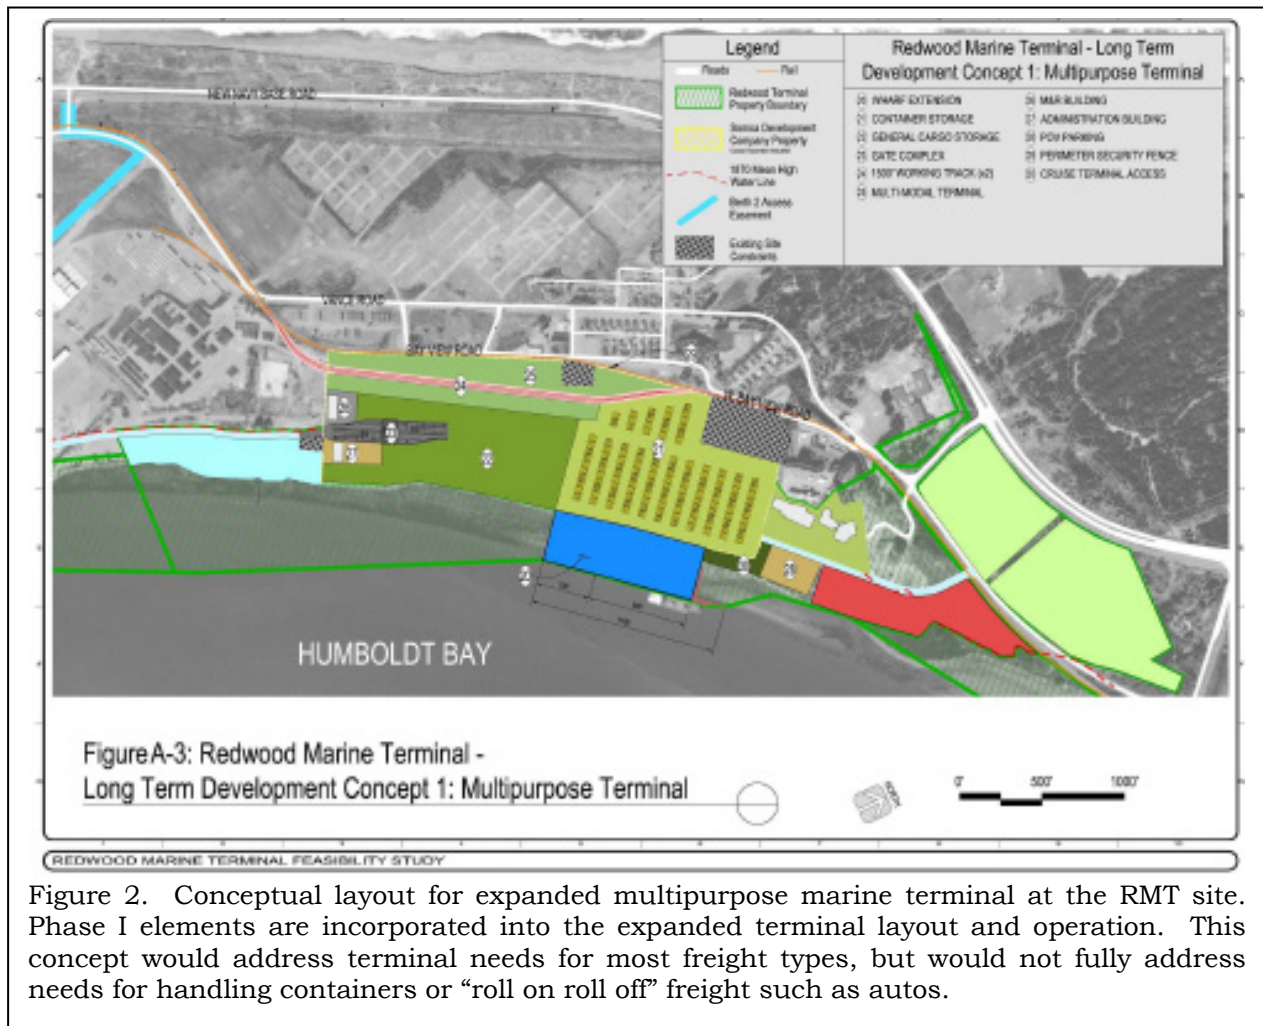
Conceptual layout for expanded multipurpose marine terminal at the RMT site. Phase I elements are incorporated into the expanded terminal layout and operation. This concept would address terminal needs for most freight types, but would not fully address needs for handling containers or “roll on roll off” freight such as autos.
